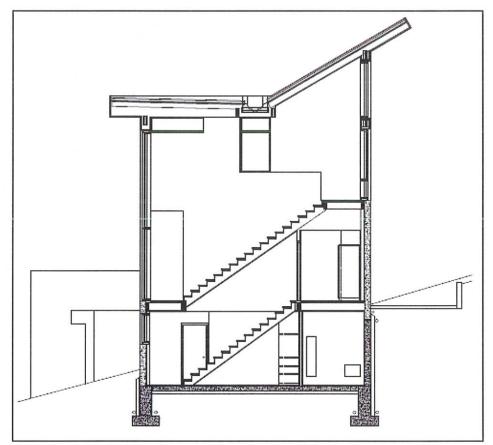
Section view of proposed house (base drawing source: Detail 2 on drawing A3 0, by Ballman Khapalova, dated April 12, 2021).
